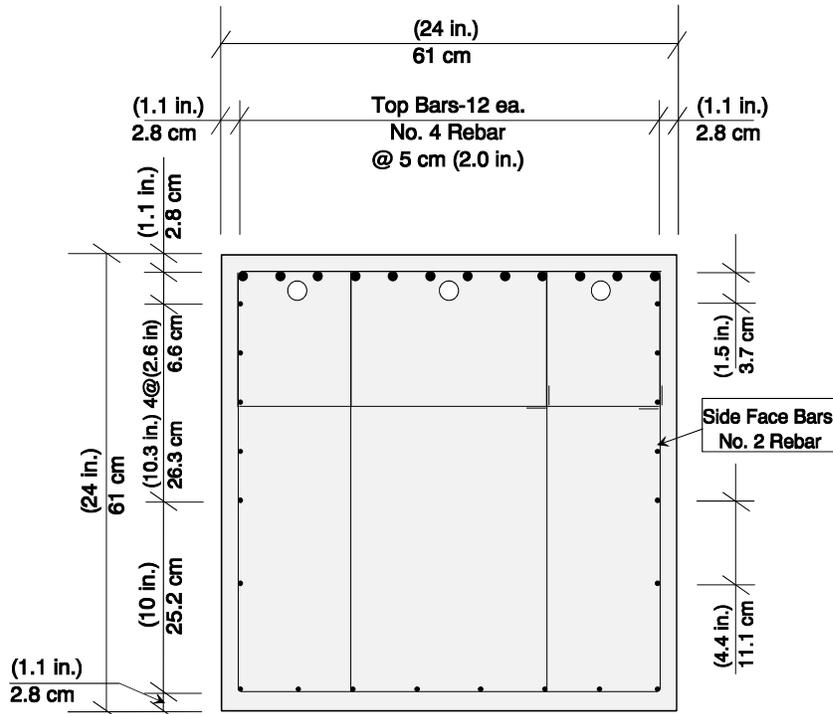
POJ-PU-54-TH overhang cross-section details
